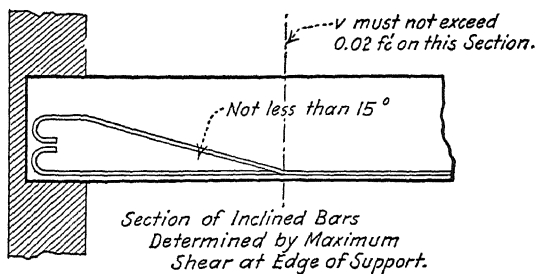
Typical Beam with Web Reinforced by Means of Bars Bent Up in a Single Plane.
